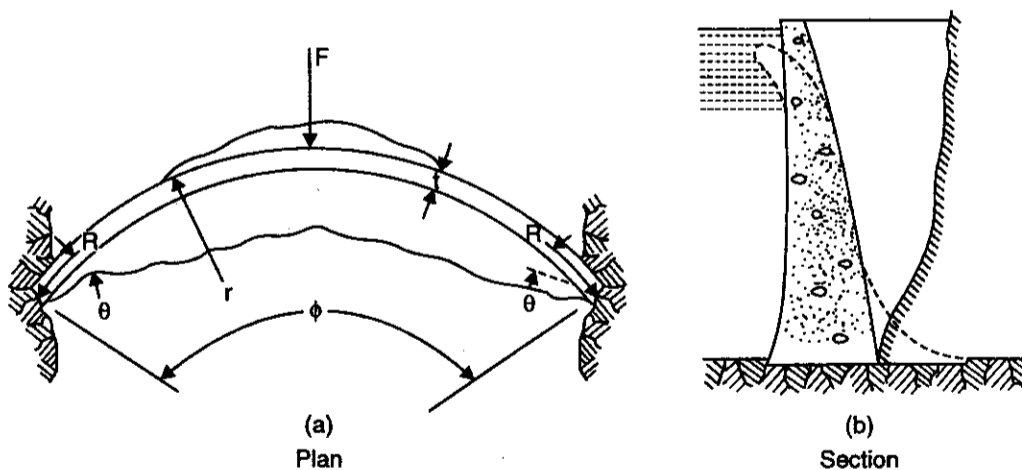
Typical arch dam : (a) Plan (b) Section.
